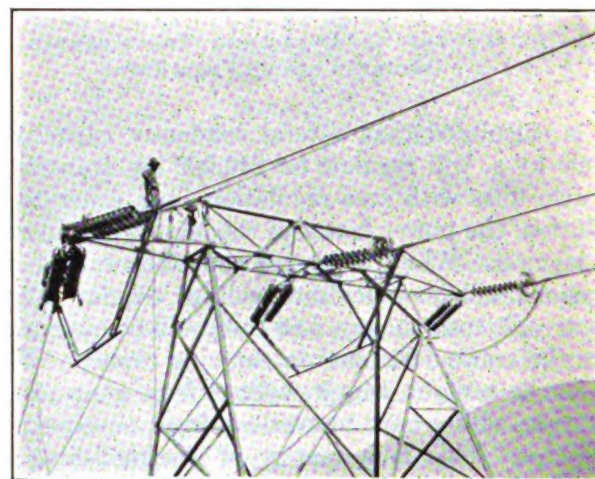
ERECTING SHIELD RINGS ON DEAD-END TOWER
